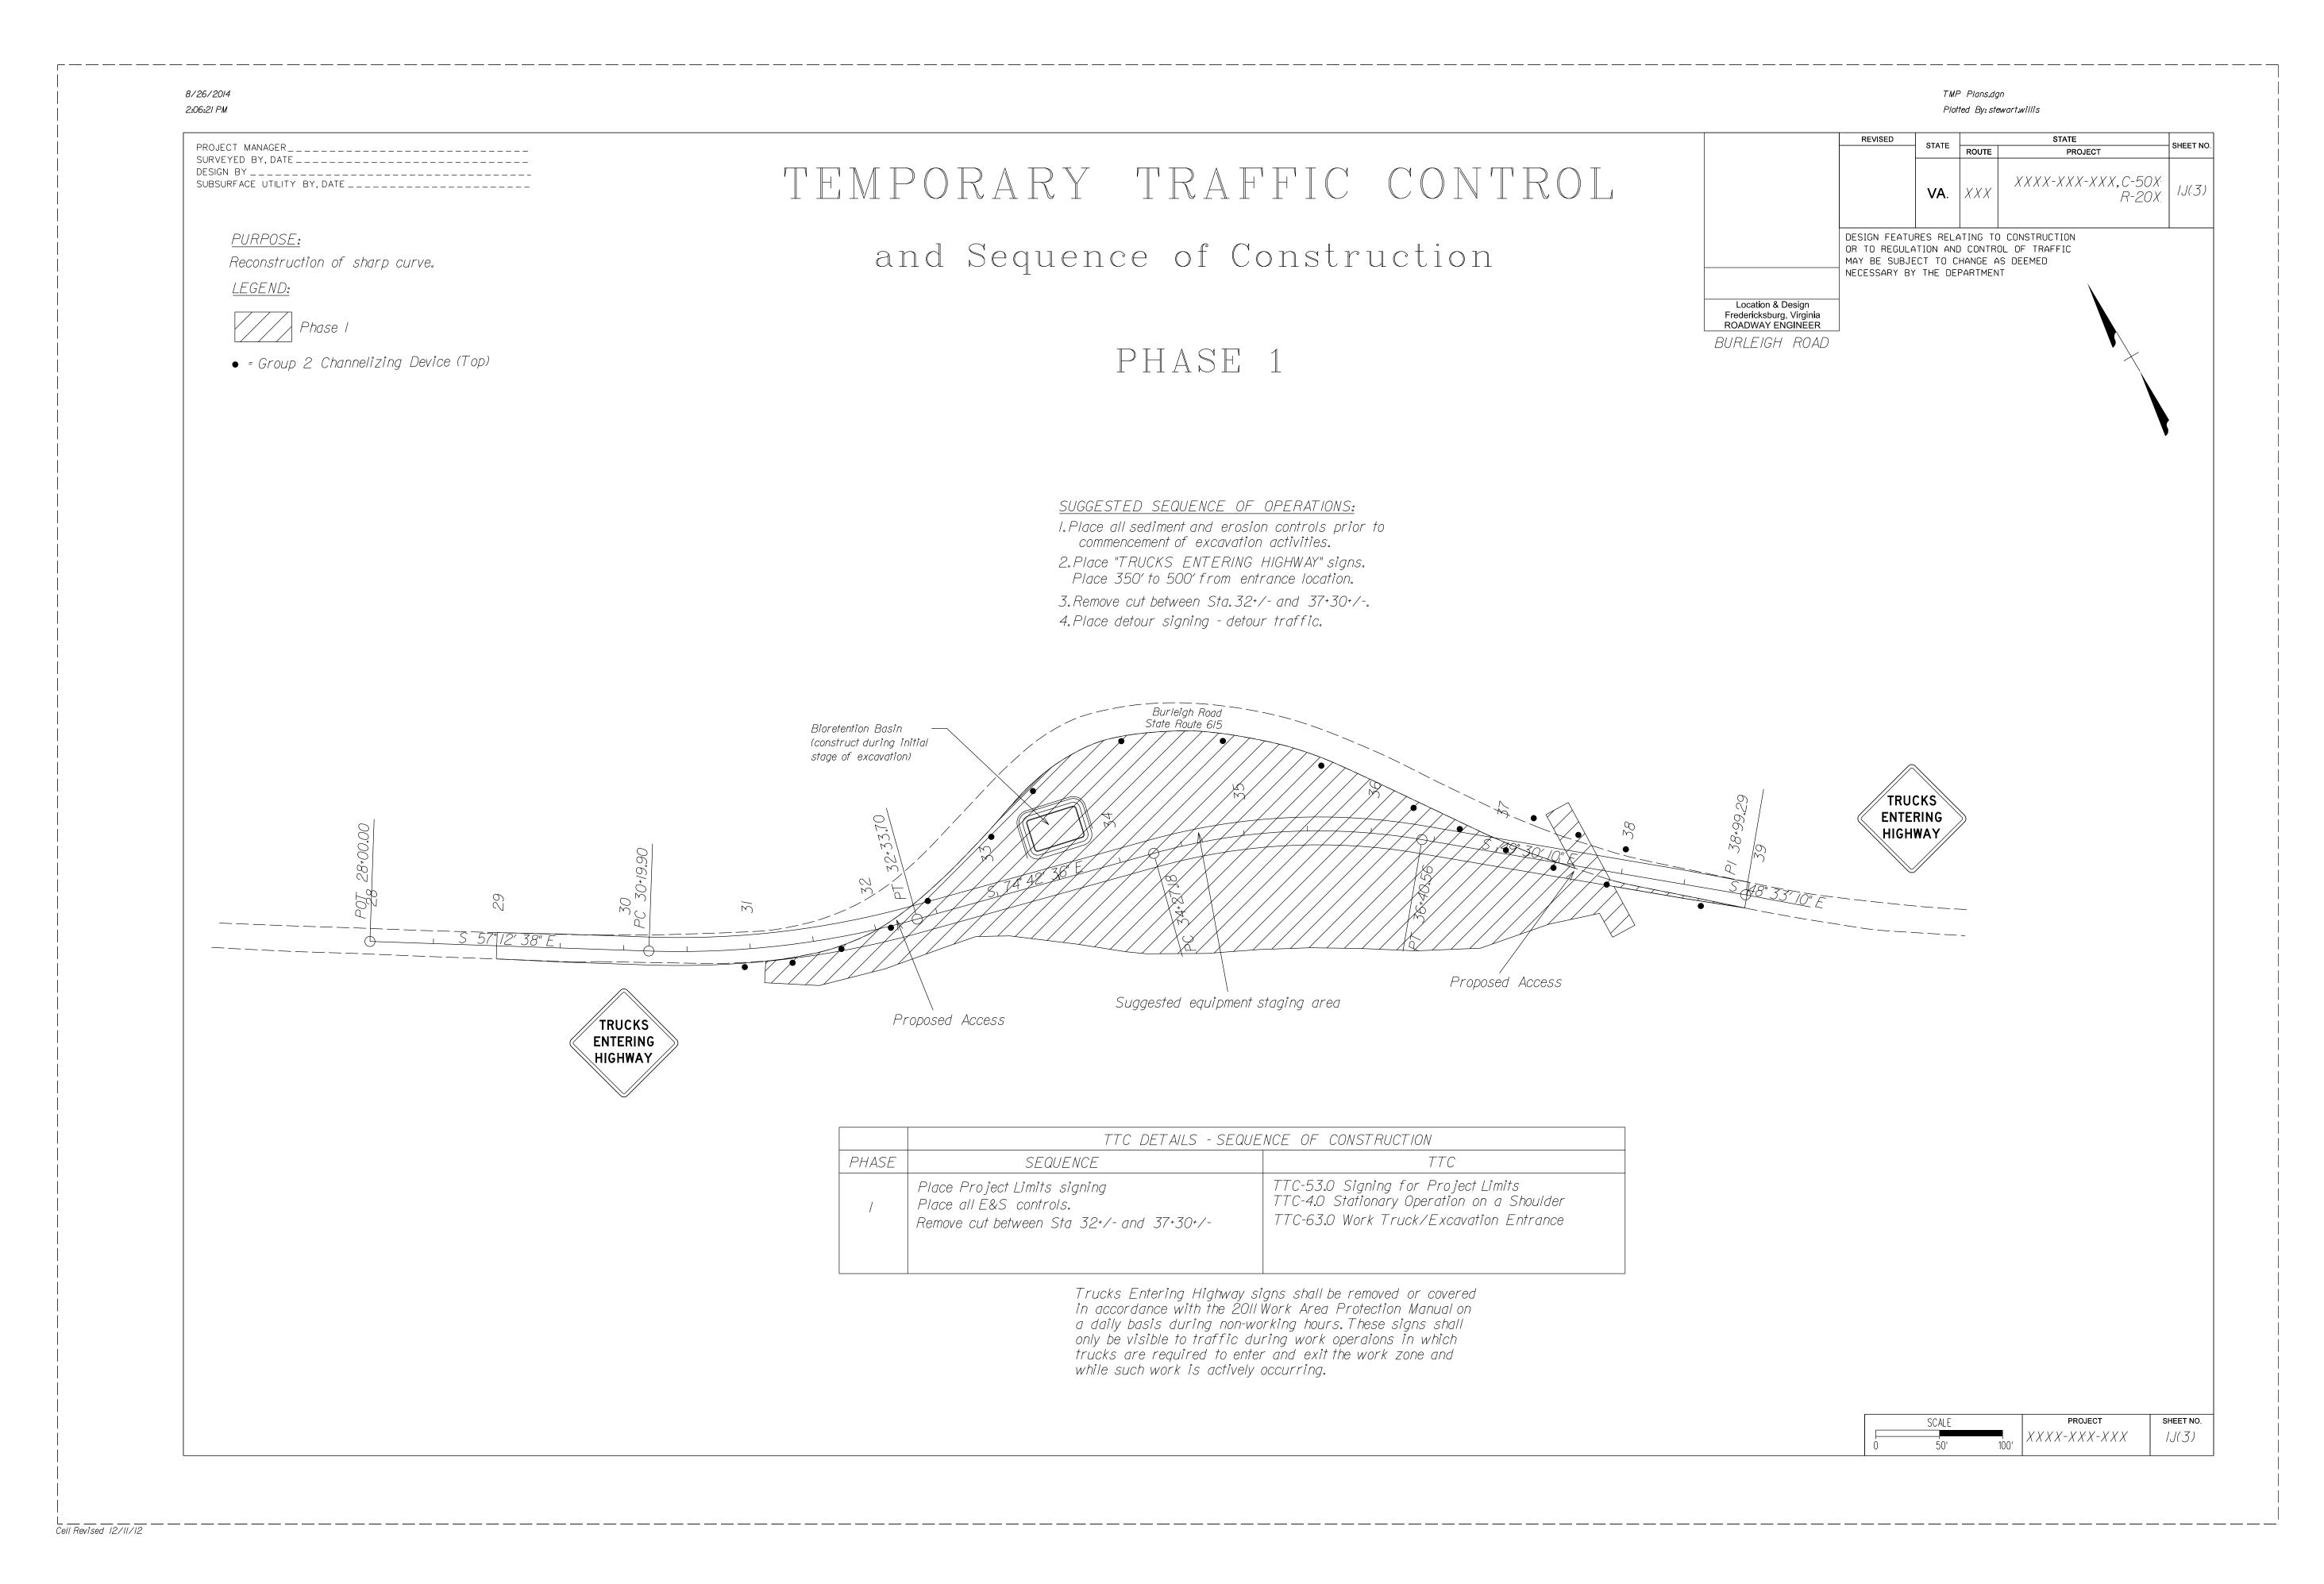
H - 13 SAMPLE TRAFFIC MAINTENANCE PLAN (TMP) SHEET
